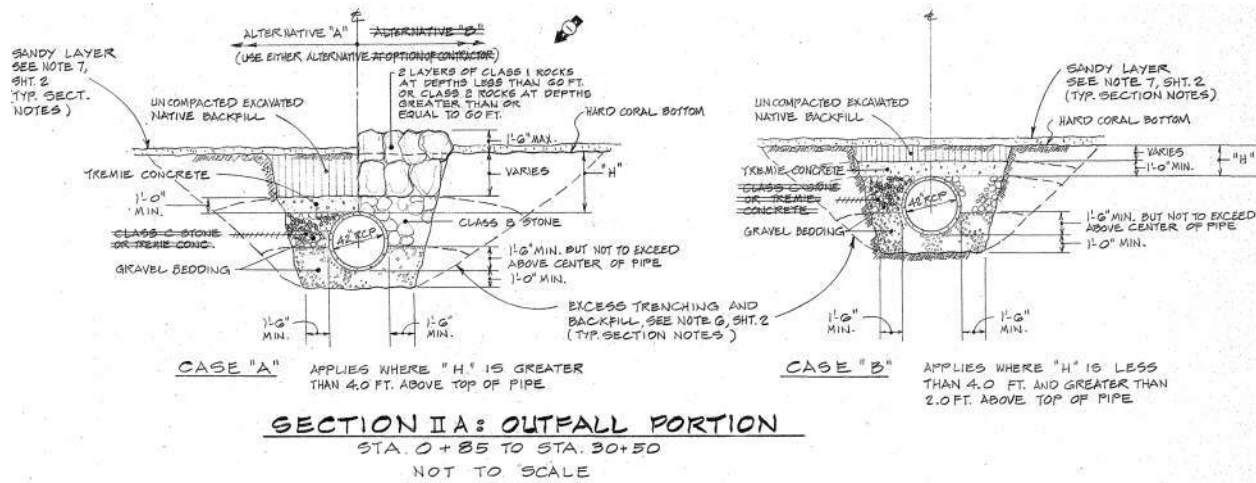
Typical section of trenched outfall configuration, from 1986-dated as-built plans for 42-inch extension
